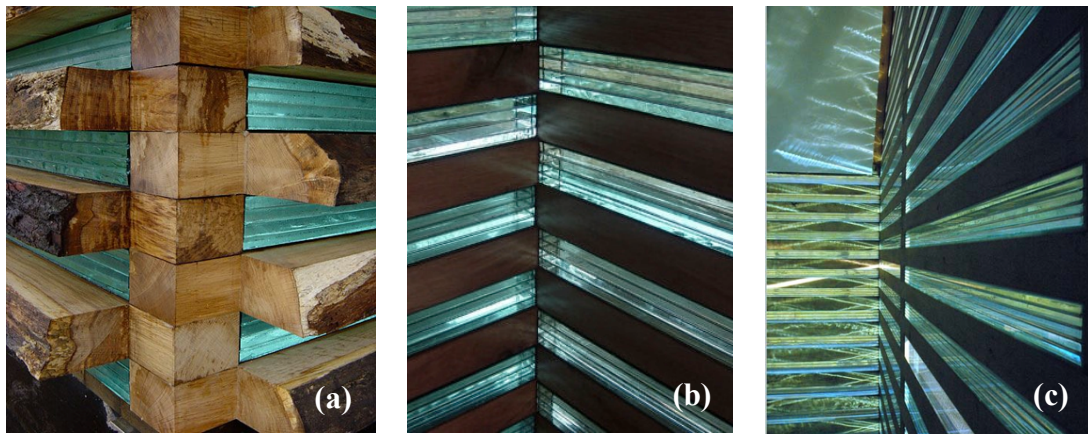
(a)Facade detail (Url-140). (b)Interplay of light and shade (Url-140).
